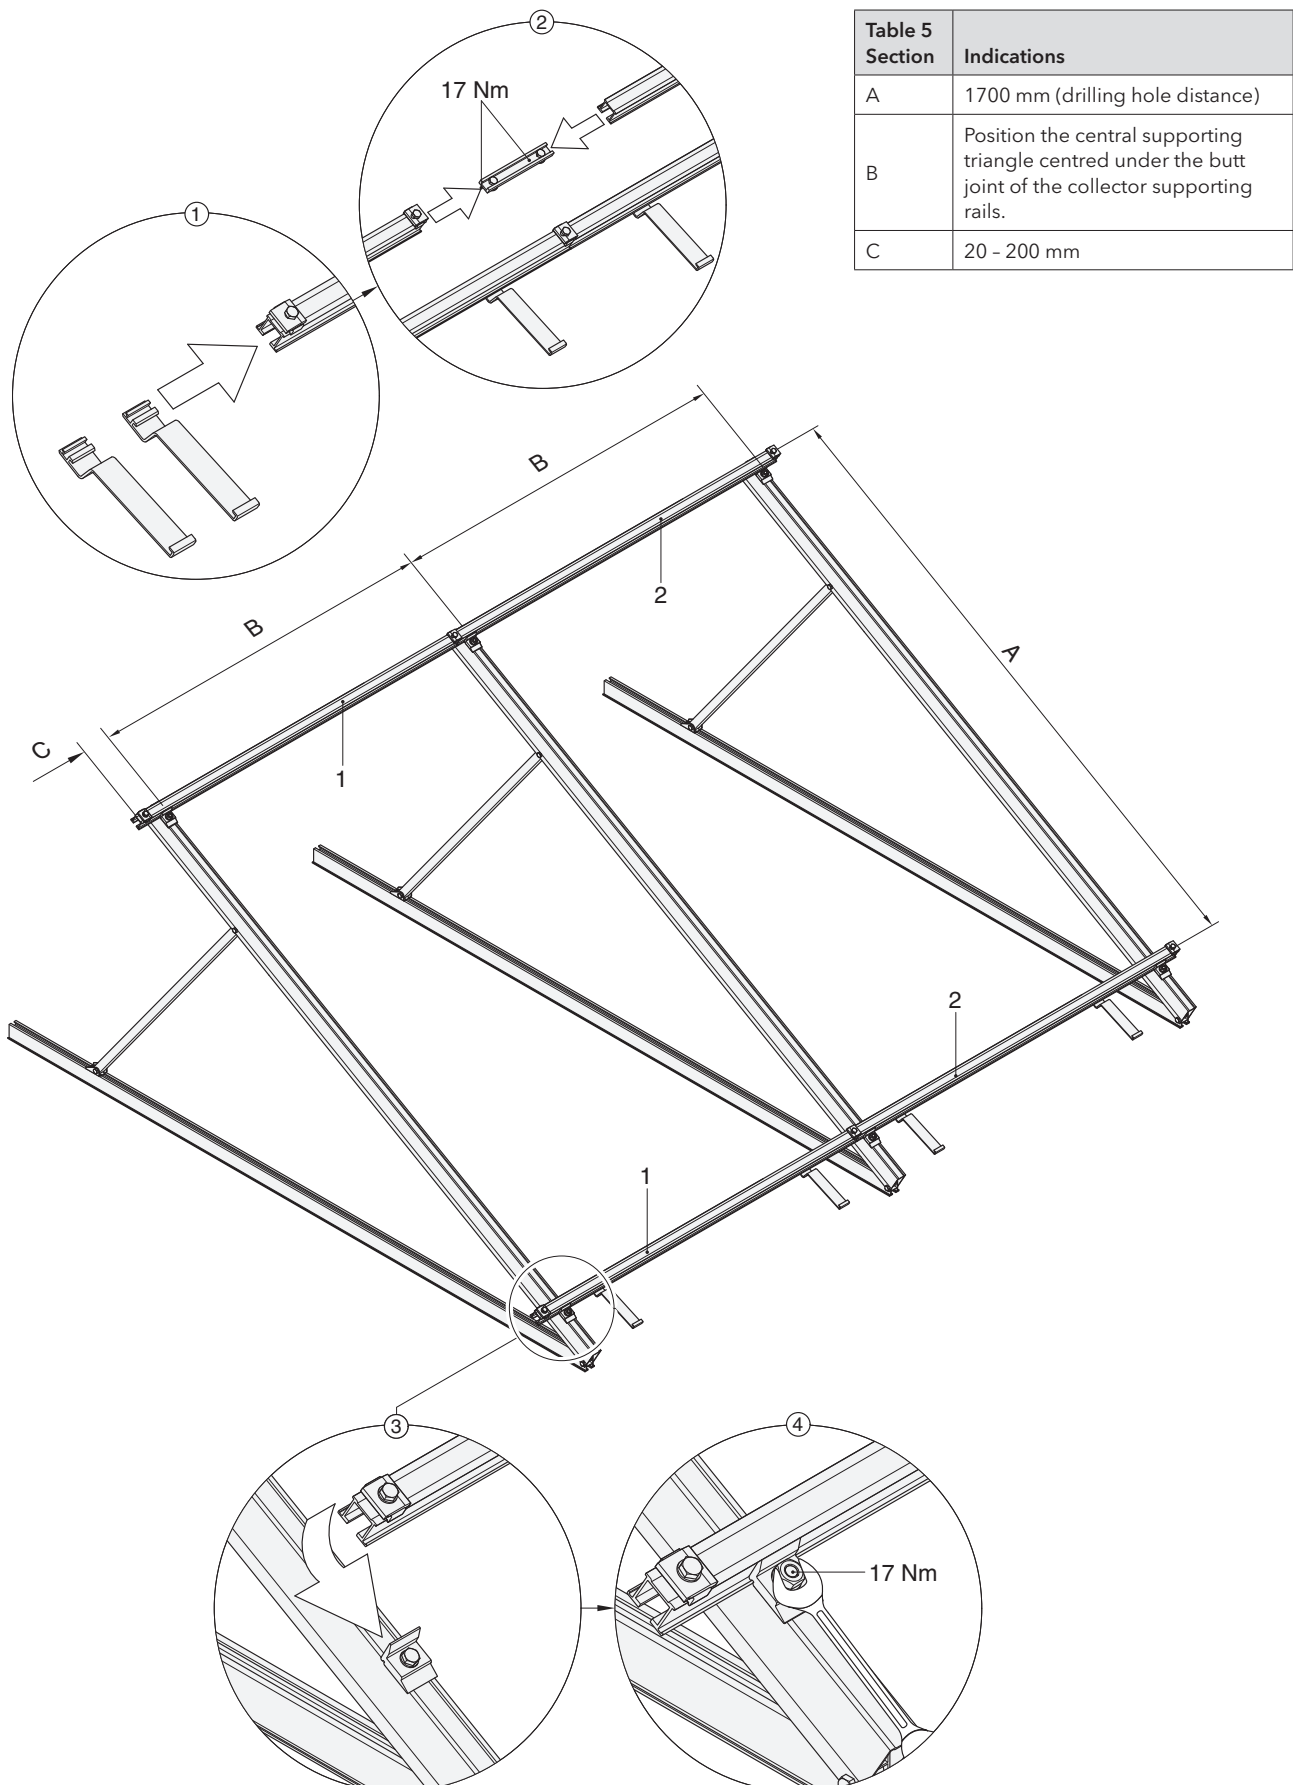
Overview supporting rail installation 1 rail with two collector clamps 2 rail with one collector clamp
